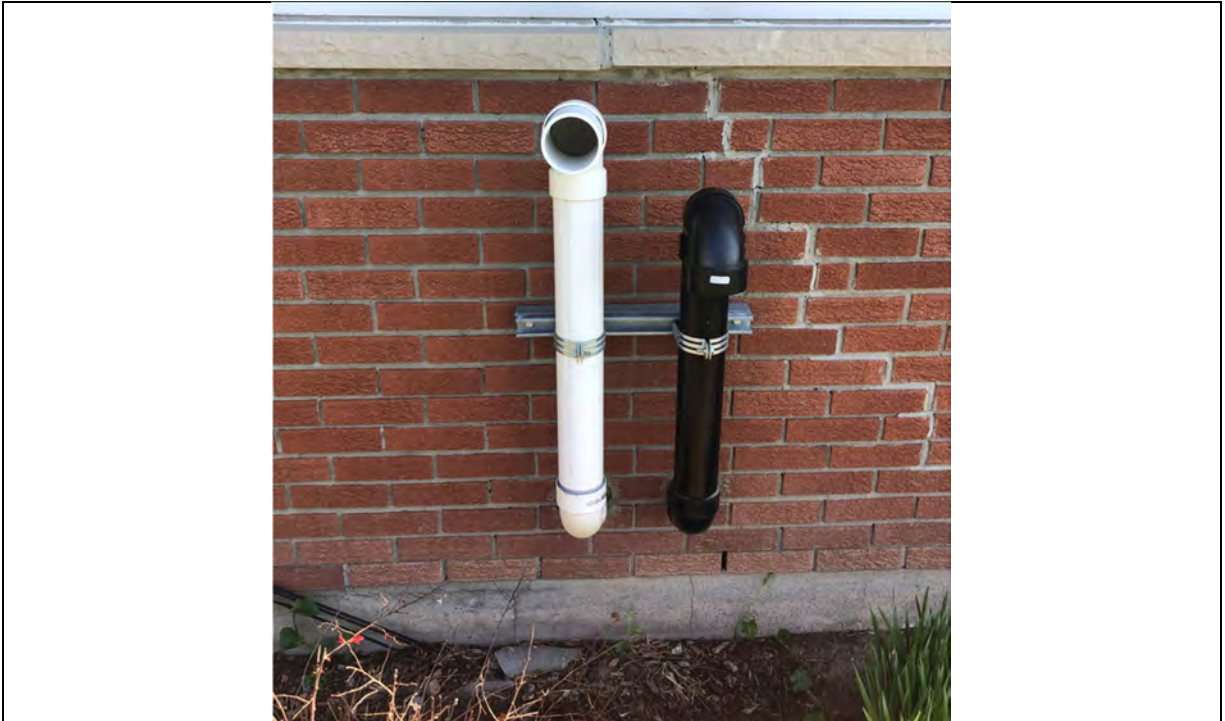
View of HVAC system vent pipes associated with the site building, on the southern exterior building wall .
